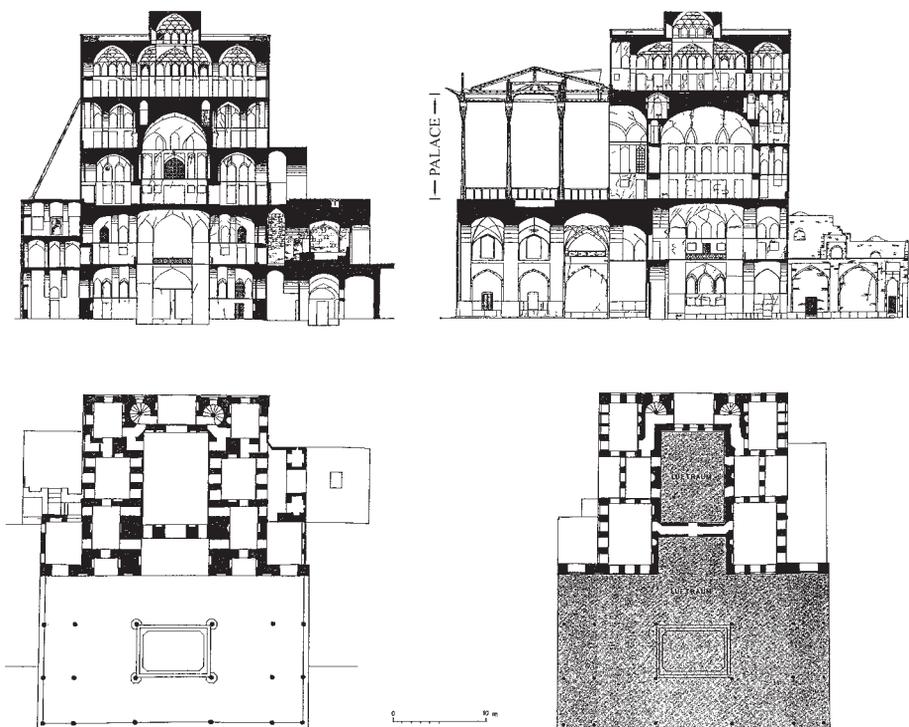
Isfahan. Ali Qapu. Plans and sections of ground and upper floor of the royal palace, erected on the gate building of the palace area (after Zander/Ferrante, 1968).
